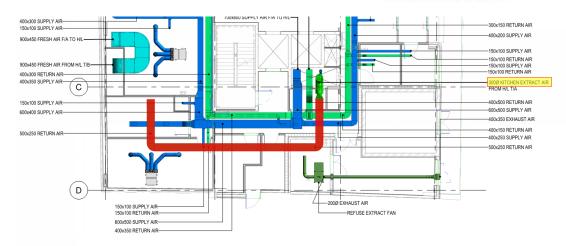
Kitchen extract duct highlighted in red routed from kitchen to riser. Clear access to the extract duct for maintenance is allowed for on each floor via the services riser.
